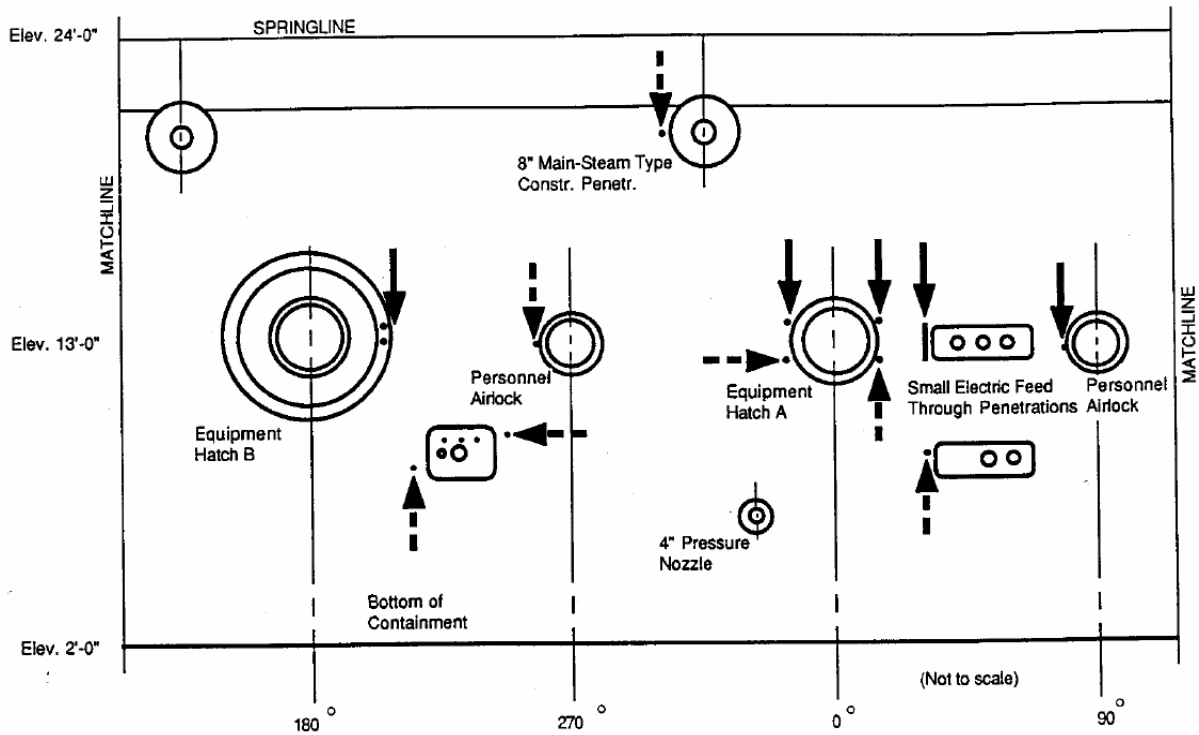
1:6-Scale Reinforced Concrete Containment Model Construction
